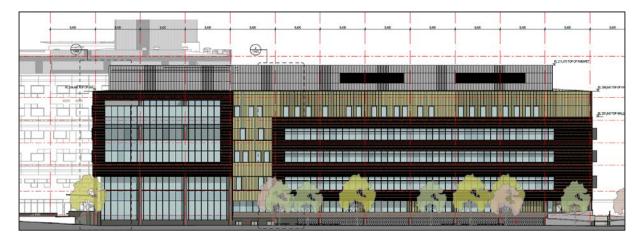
| North elevation with Stage 2 ASB in background (Source: EIS)
